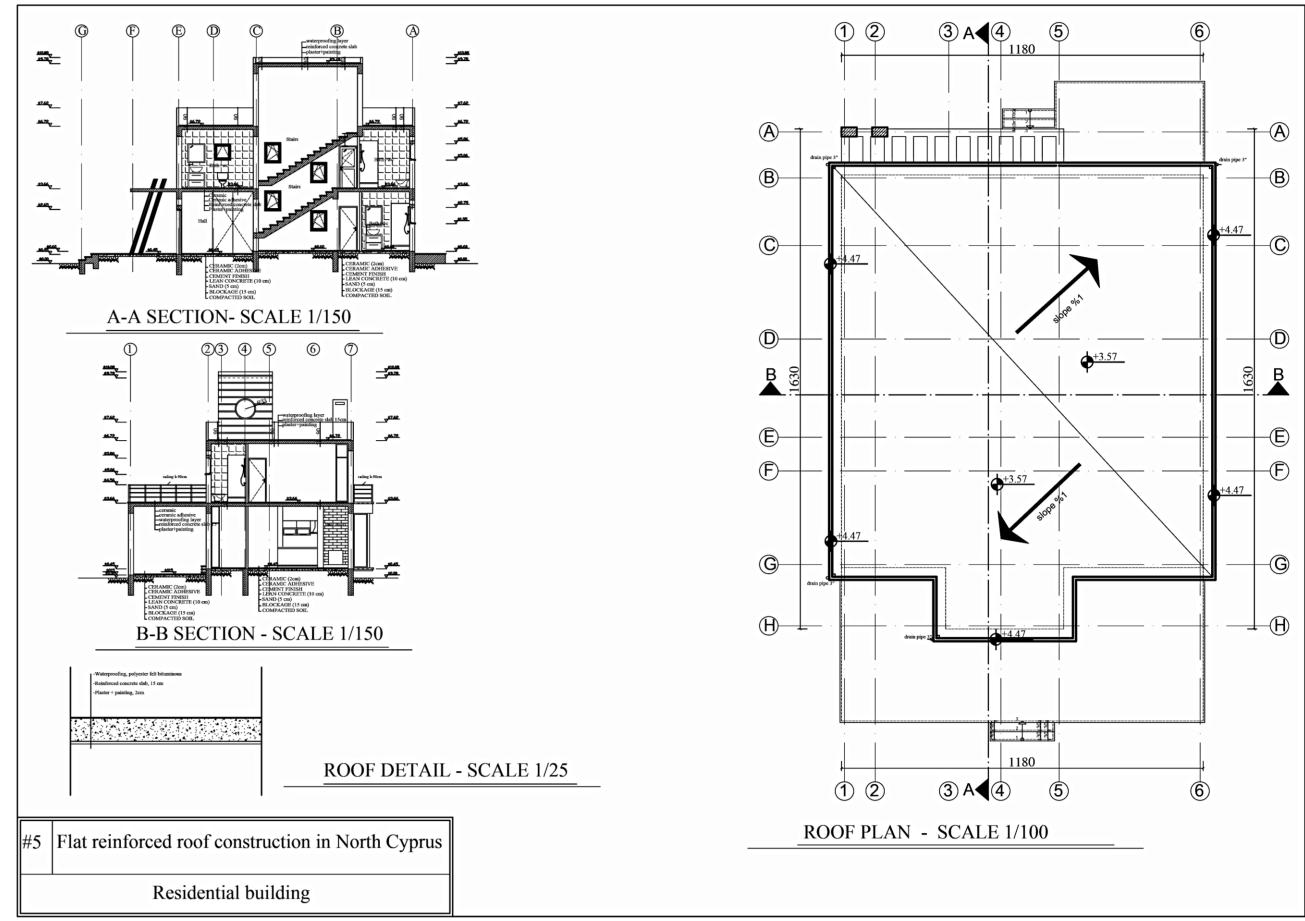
Flat reinforced concrete roof construction in North Cyprus
